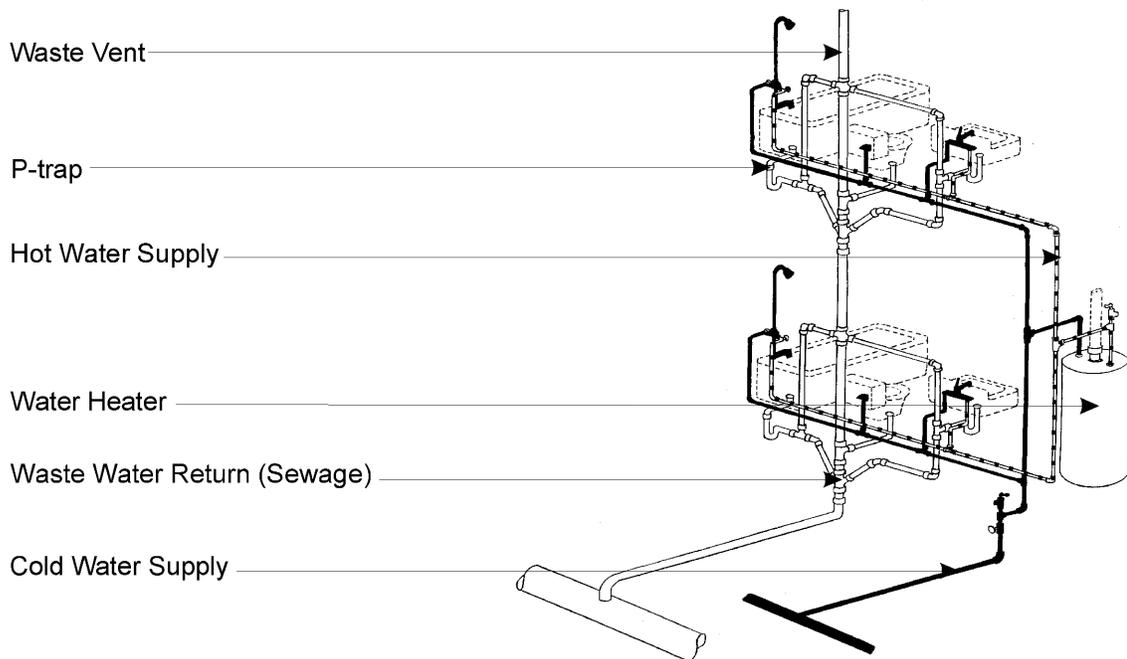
Plumbing system showing risers, branch pipes, drain pipes, traps, vents
